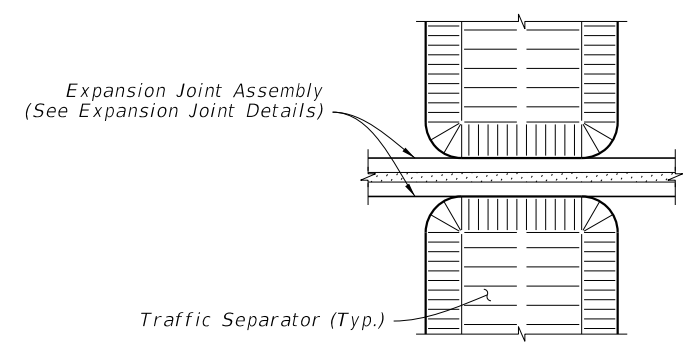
DETAIL AT Poured Joint With Backer Rod Expansion Joints
